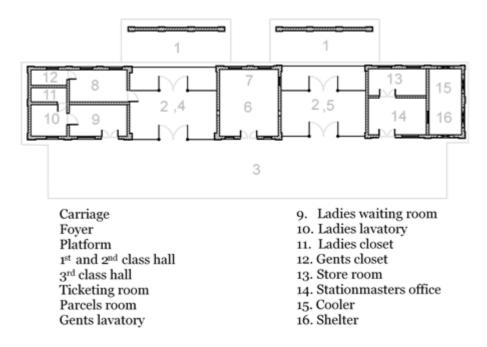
, plan view of the Badulla railway station (source: Survey department, architectural drawing no 06342)
